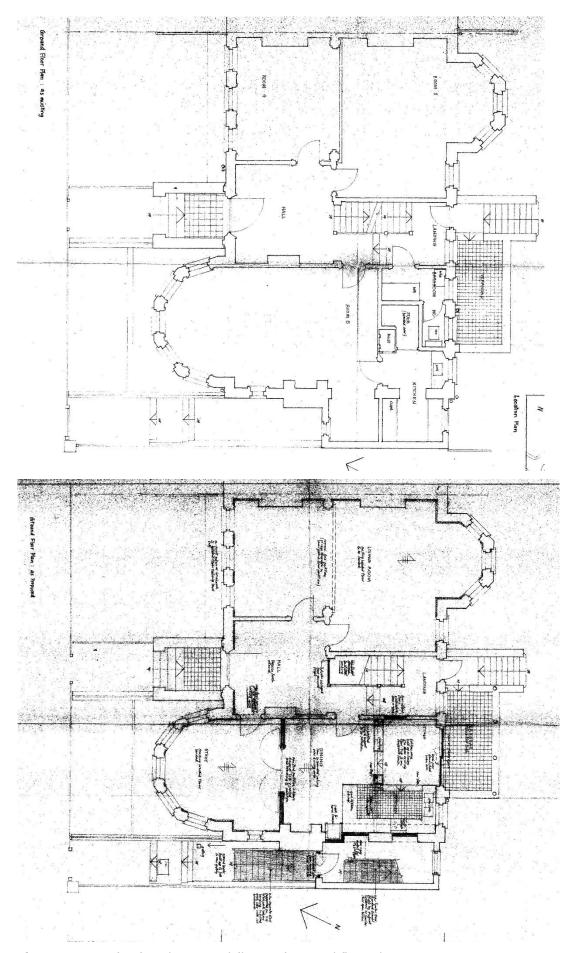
Existing (top) and proposed (bottom) ground floor plans, 1981.
